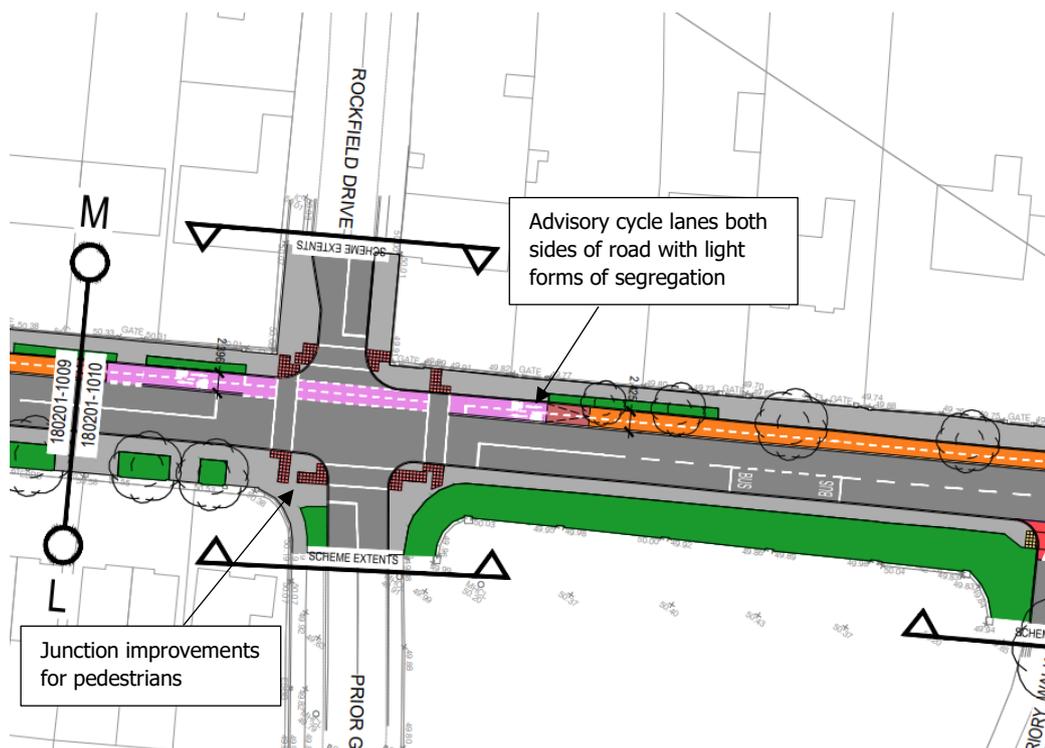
General design facilities between Templeville Junction and Kimmage Road West
